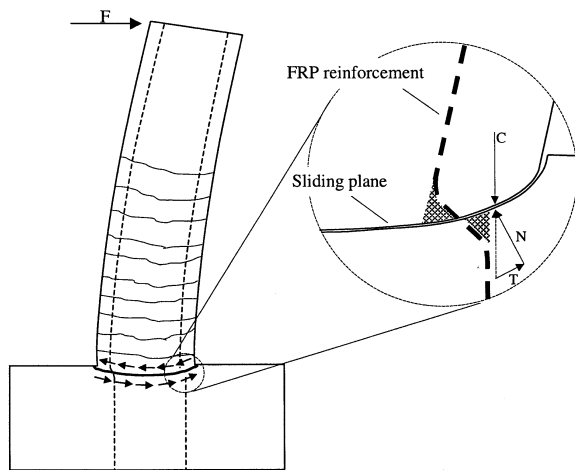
Rotational sliding mechanism and local damage to FRP reinforcement.
